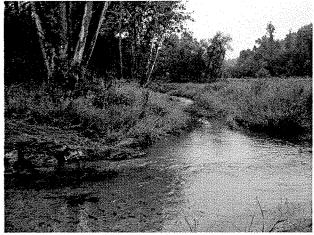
Looking upstream at root wad and log toe protection installed between MS Stations 20+90 and 20+60. (9/27/04)
